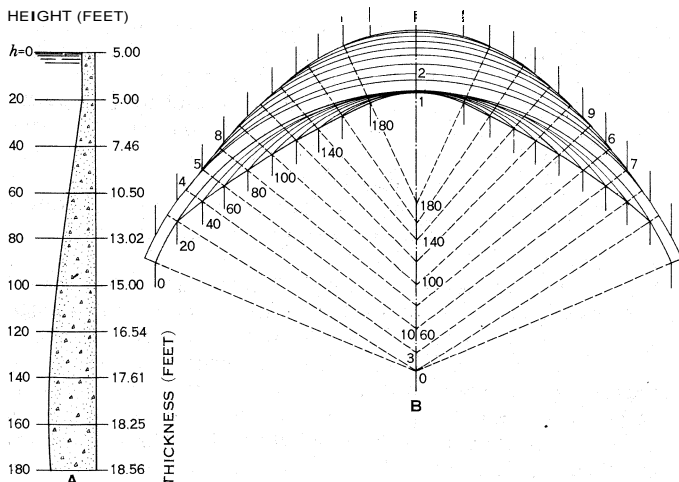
SIMPLEARCHED DAM SHOWING (A) THE SECTION ON THE CENTRE LINE AND (B) THE PLAN VIEW
